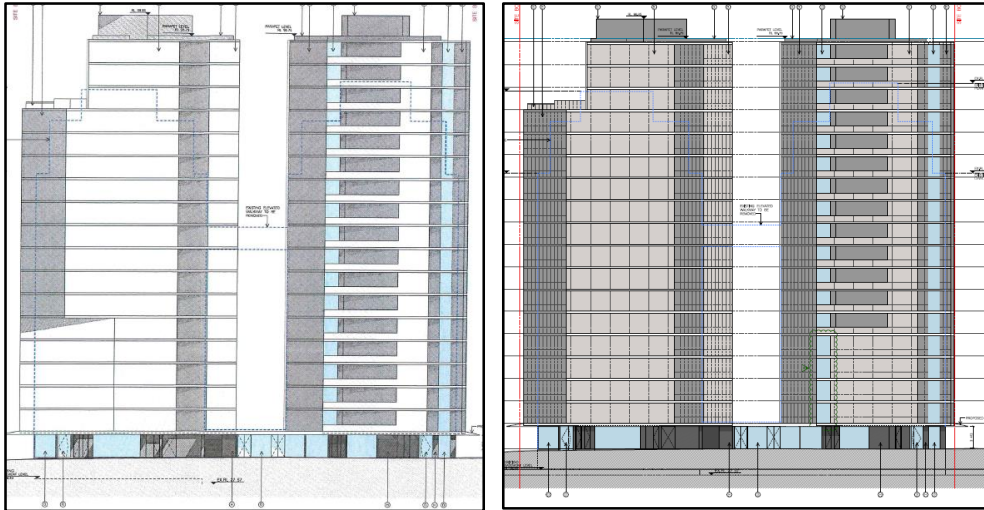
Southern elevation (approved and proposed) Source: Candalepas Associates + Wendy Lewin
